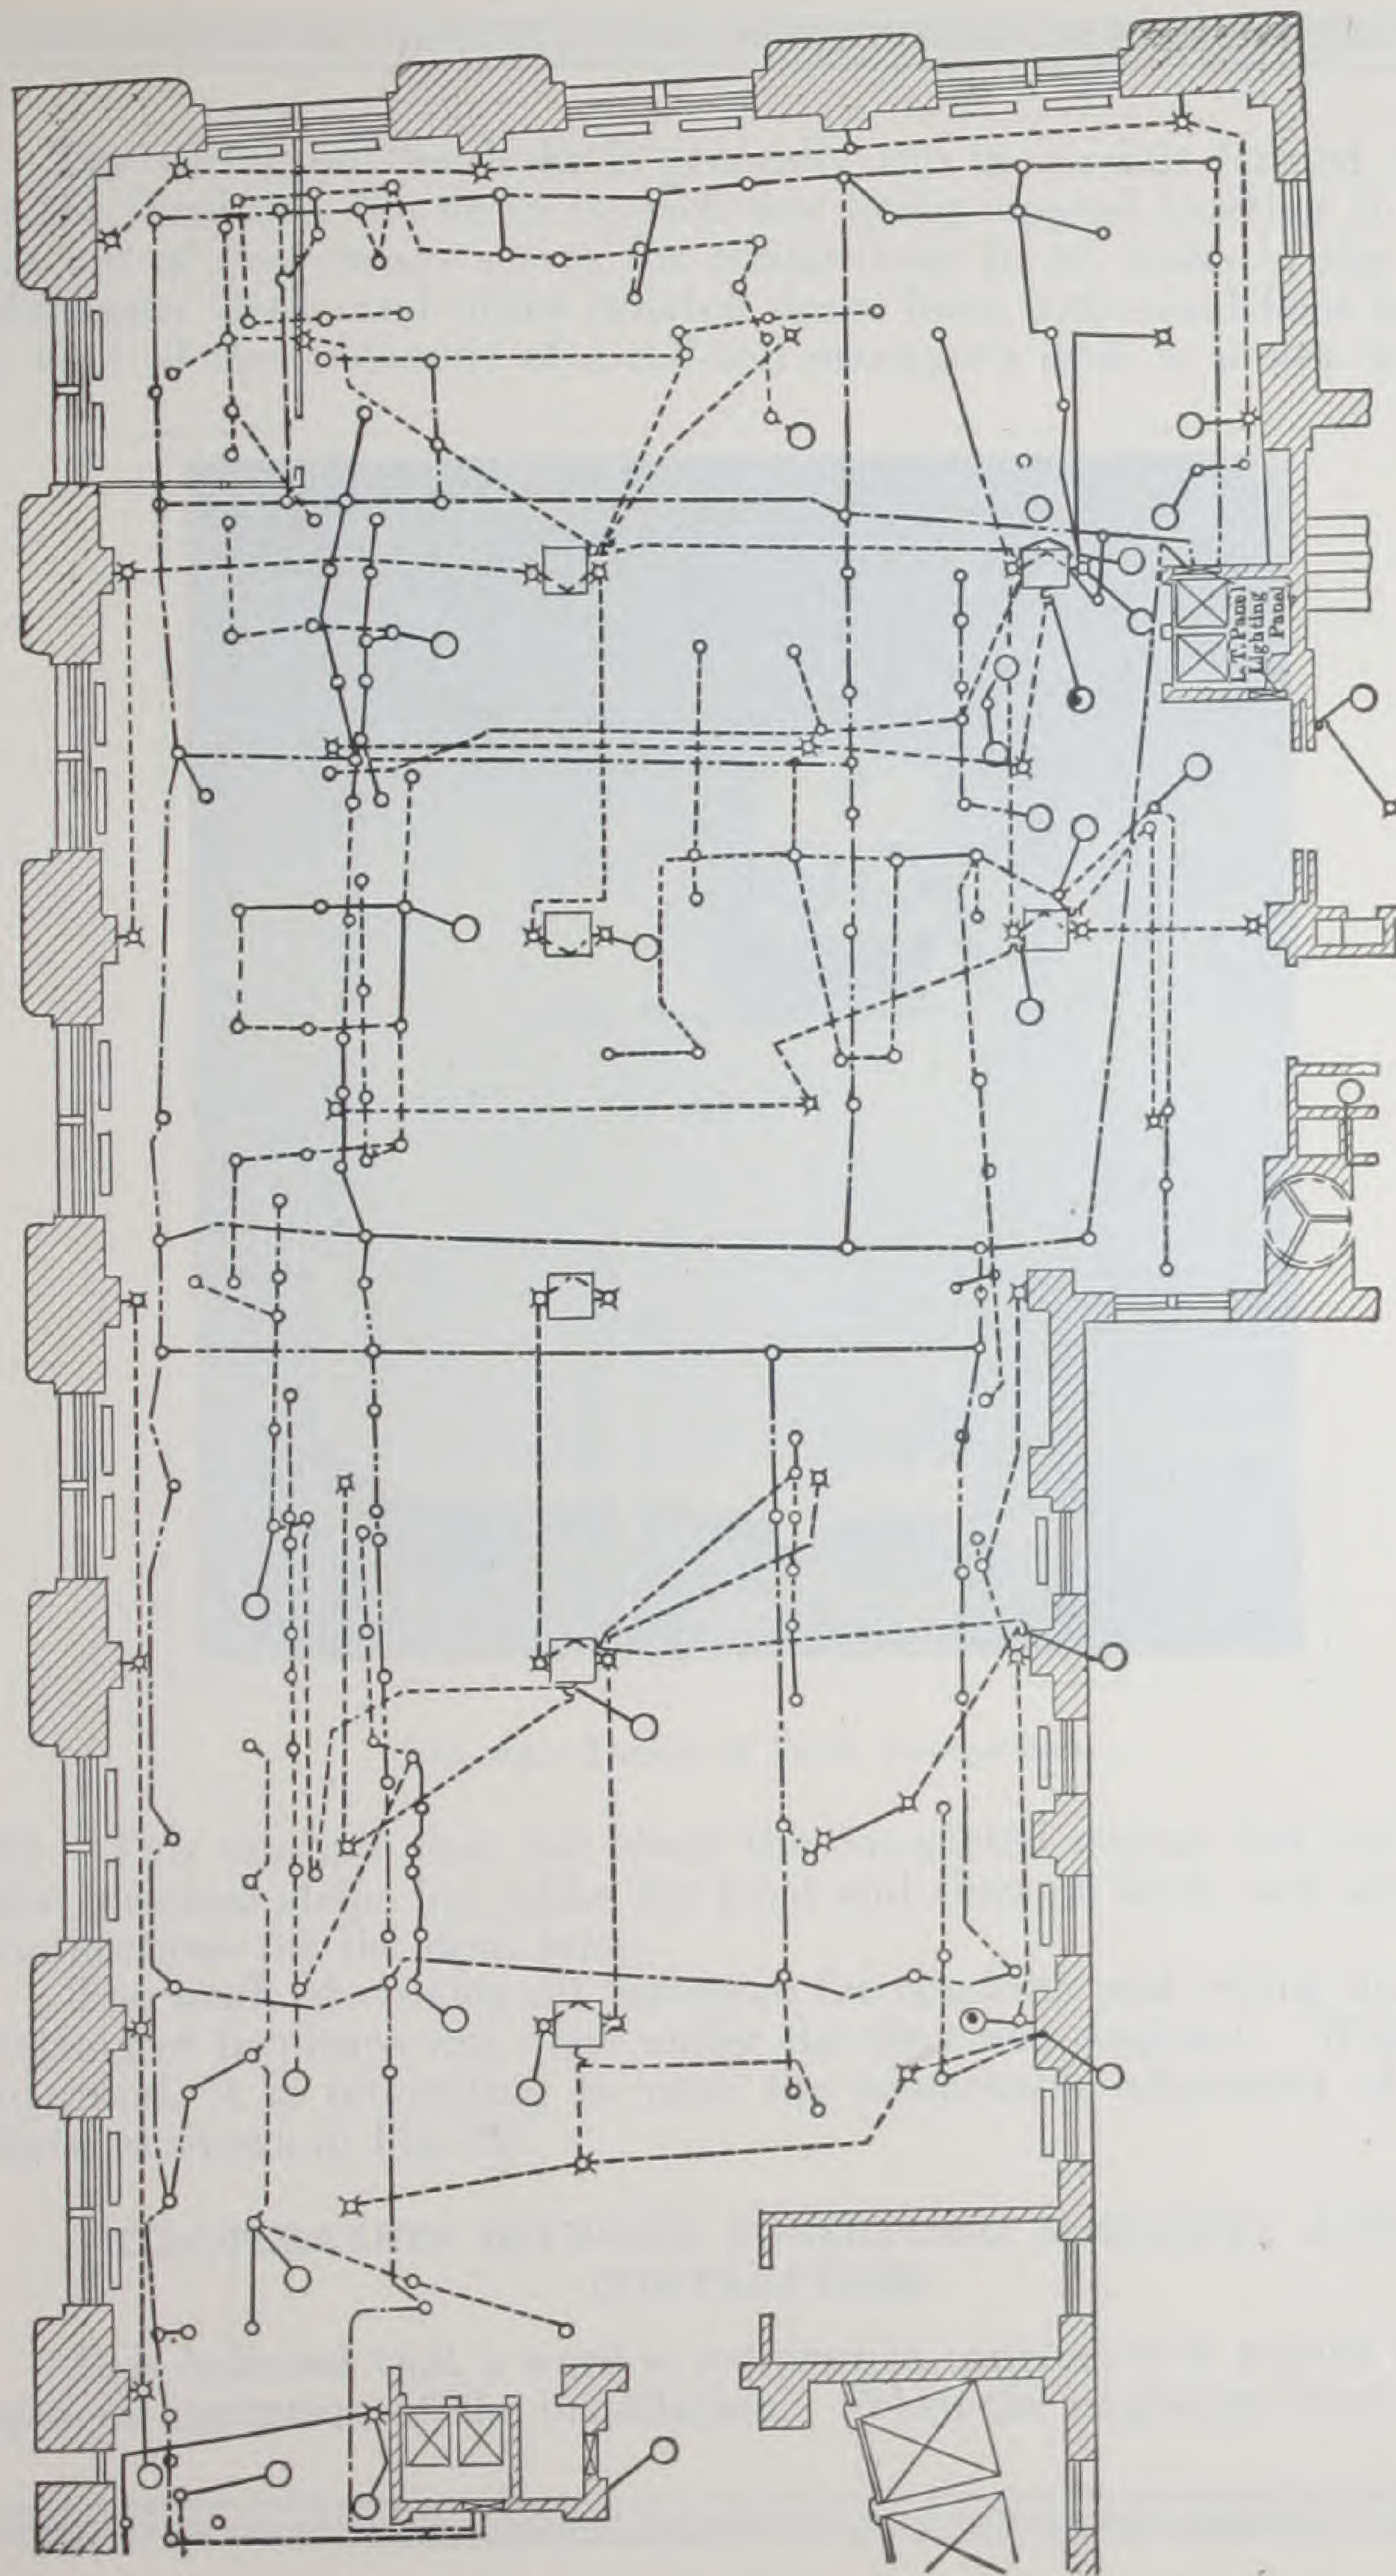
Conduit Runs Under Floor in the Old Building Before Remodeling.
